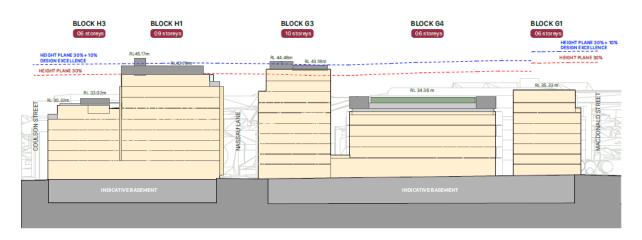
Proposed amended sections - buildings G and h (north-south) fronting Hadfields Street
